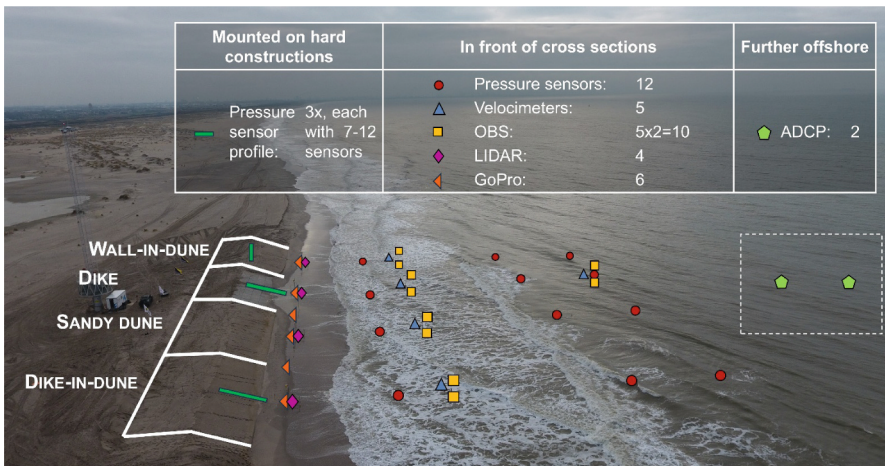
The test setup just after construction, with the concrete tiles of the dike section visible and the hard elements of the dike-in-dune and wall-in-dune still hidden under the sand.
